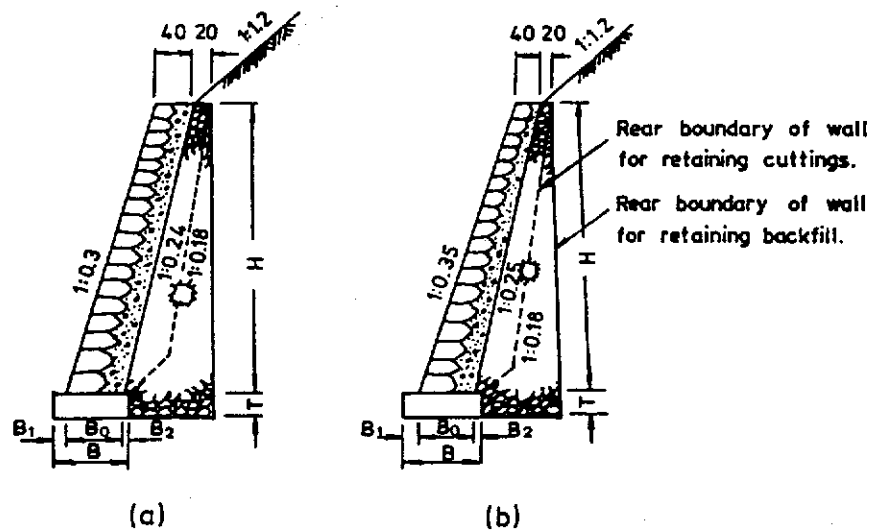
Thickness of Japanese Stone Masonry Retaining Walls
